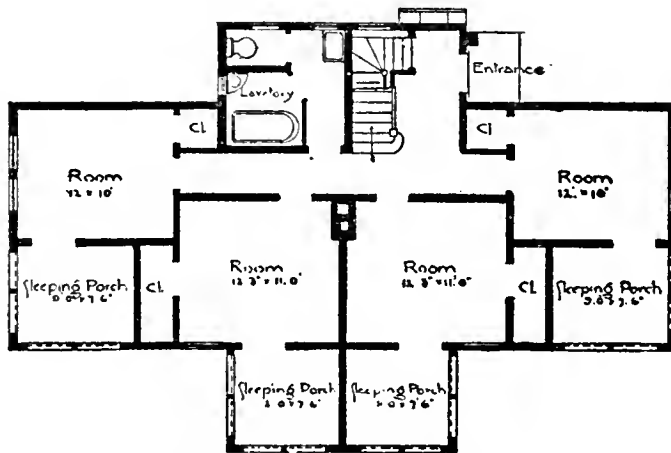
Typical floor plan of a two-story, eight-room cottage. There are a toilet and bath on each floor, and a closet and sleeping porch to each room.
